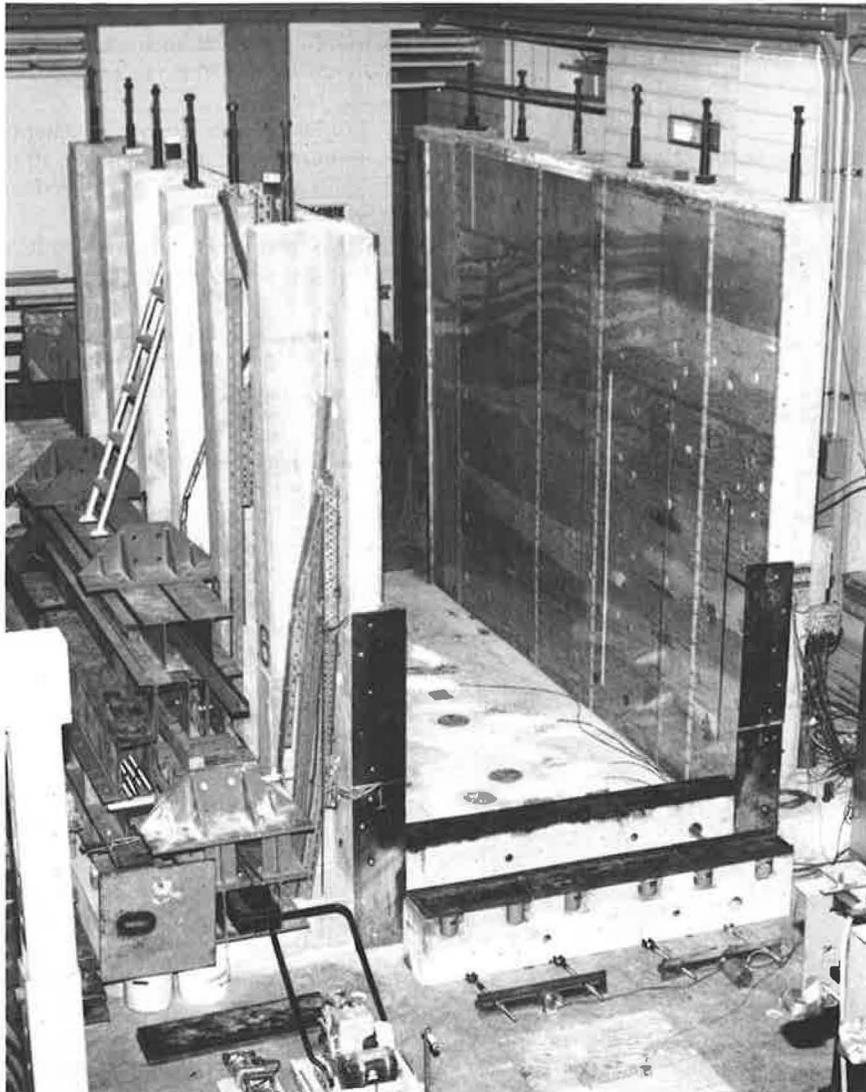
Overview of RMC Retaining Wall Test Facility.
